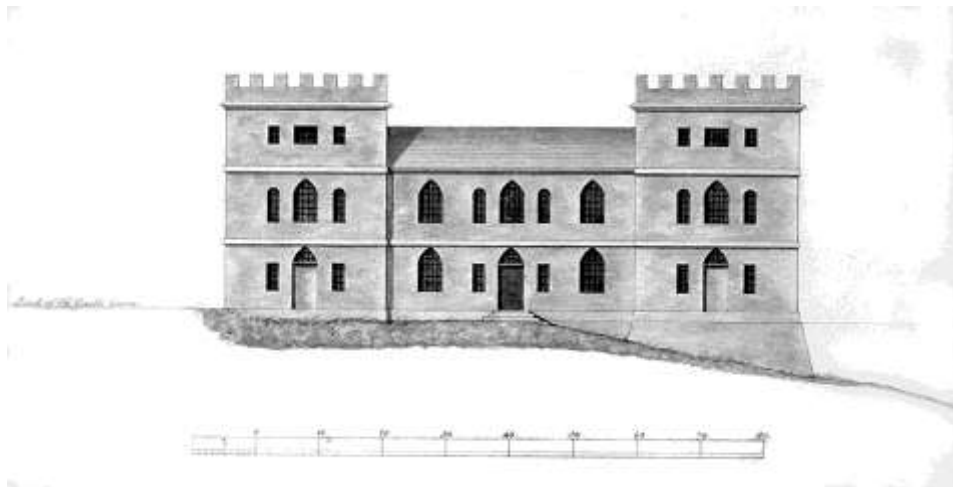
Proposed north elevation of the Bridewell, 1787 (*Hereford Reference Library*)
